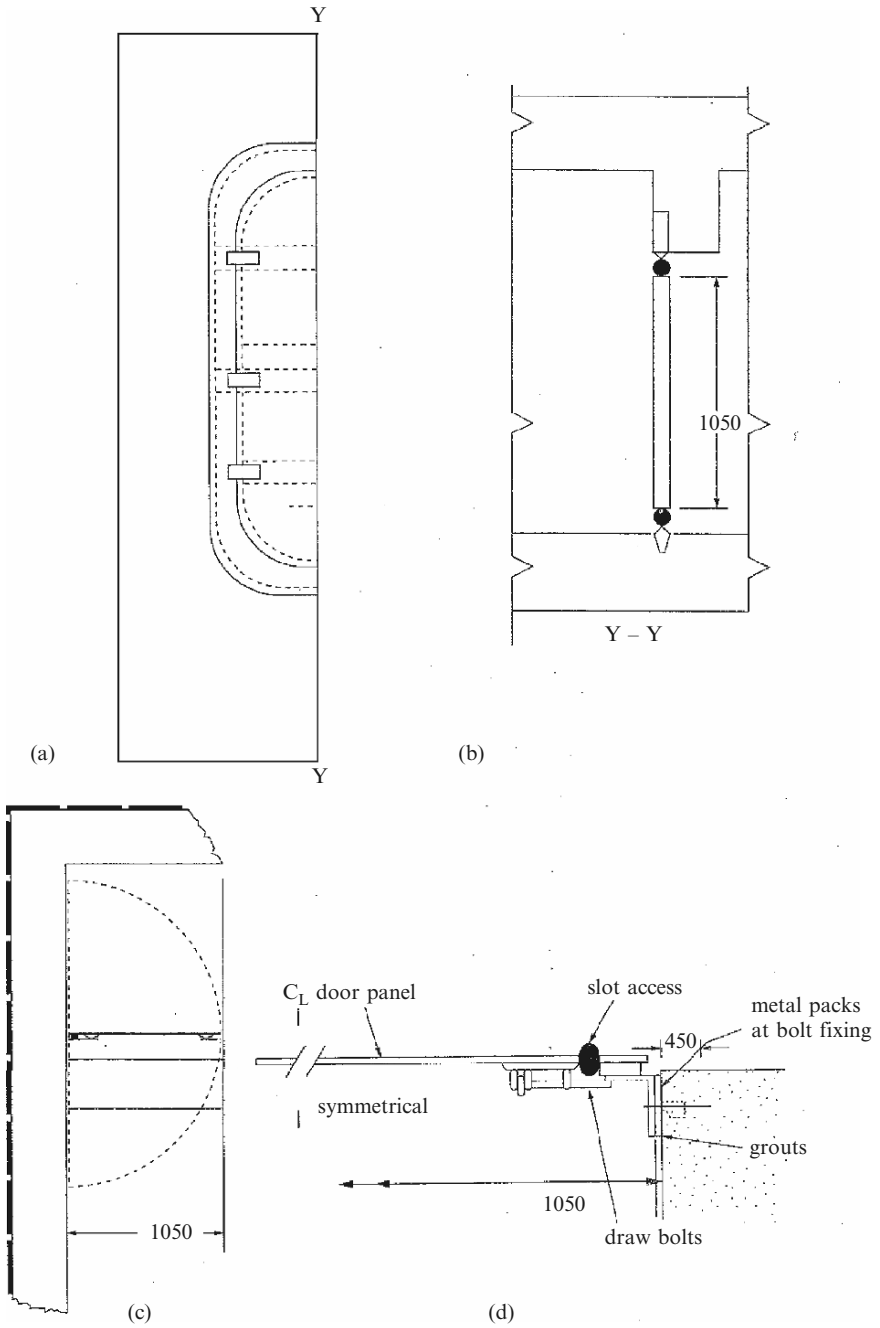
Design of steel blast doors. (a) Elevation; (b) vertical section; (c) door location; (d) horizontal section: structural details
